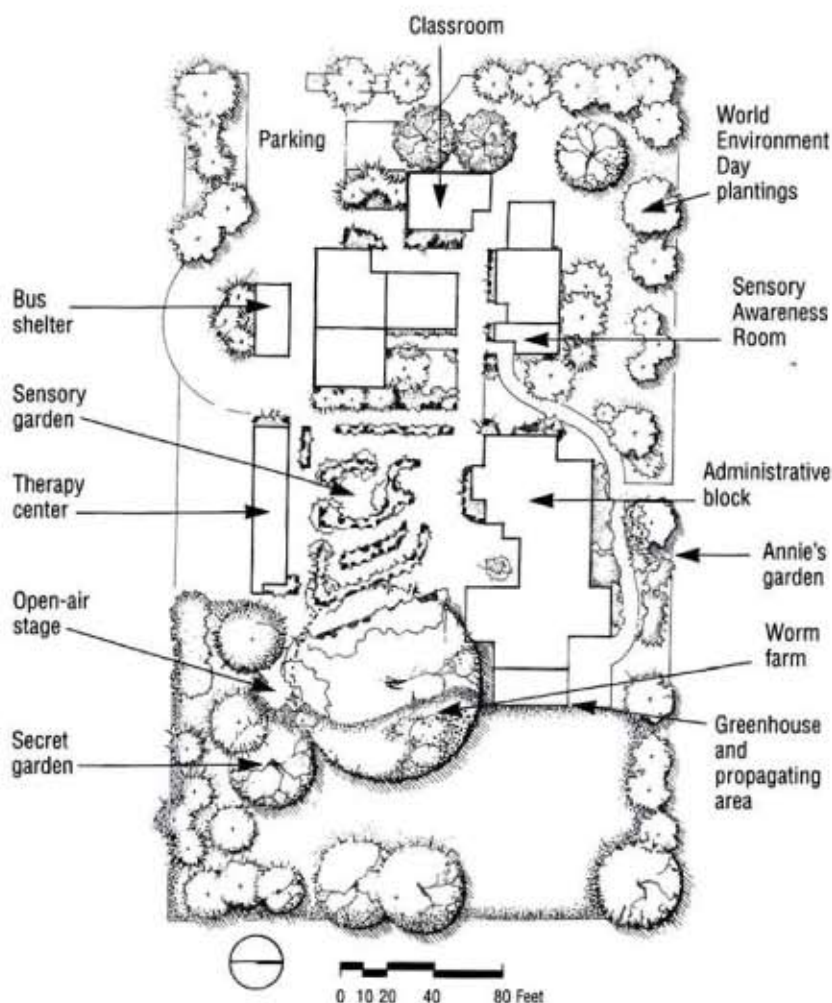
Site plan of Lucas Gardens School, Canada Bay, New South Wales, Australia.
